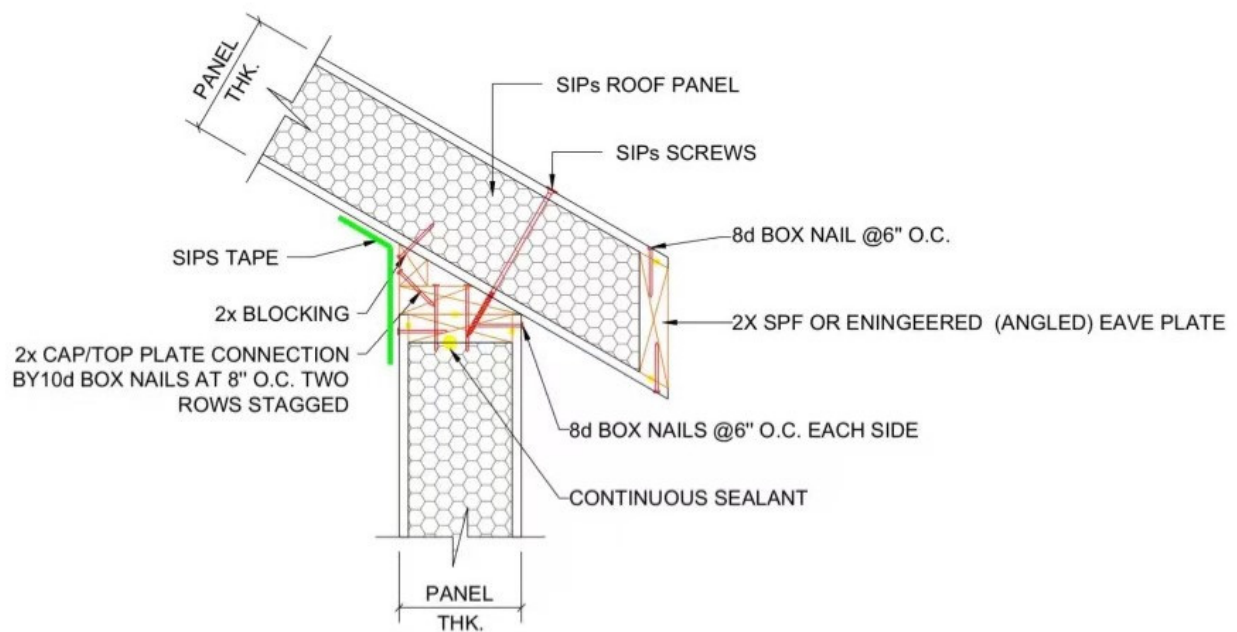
WALL PANEL TO ROOF PANEL WITH 2X BLOCKING
